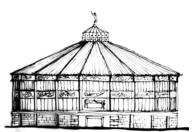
Elevation of Cirqur d'hiver. Hand drawing of facade
